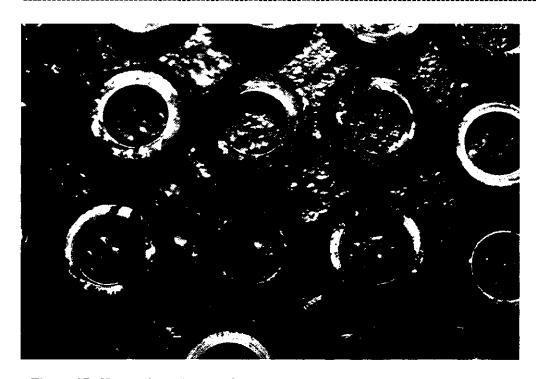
, Closer view of some of the washers showing severely rusted contact surfaces.
